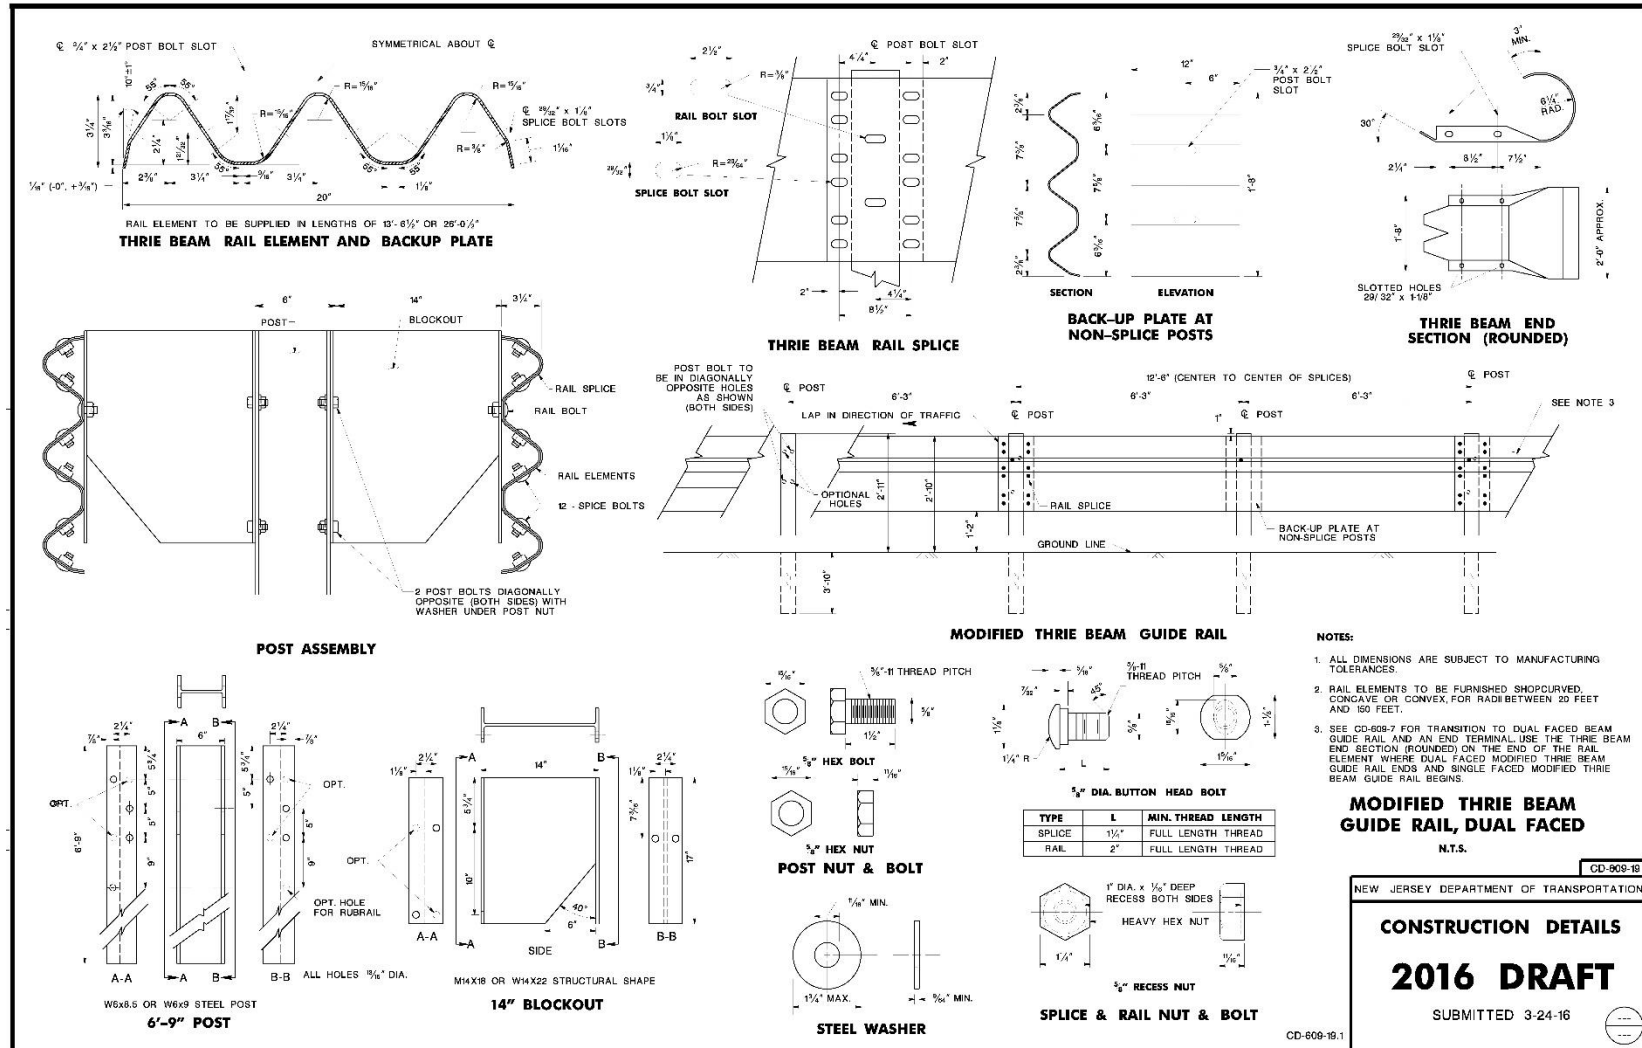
NJDOT Modified Thrie Beam Details, Test No. MTB-2
